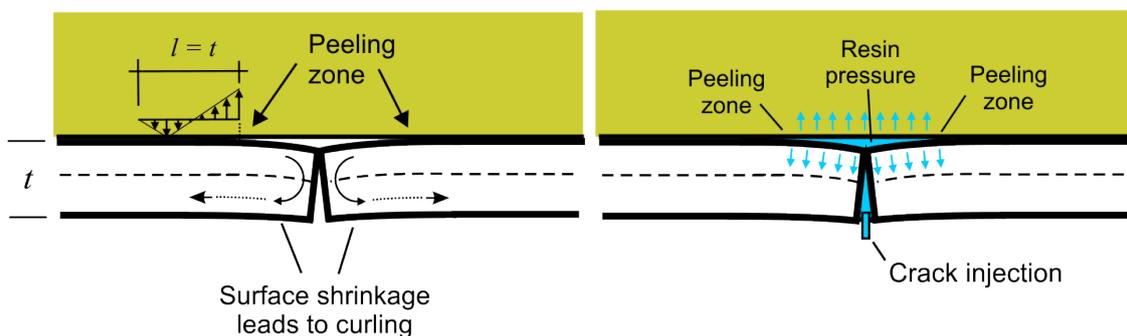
a) Curling and de-bonding of a shotcrete lining from the substrate at a crack due to differential shrinkage strains between exterior and interior regions of the lining (Reid and Bernard, 2019), and b) enlargement of de-bonded zone by resin injection.
